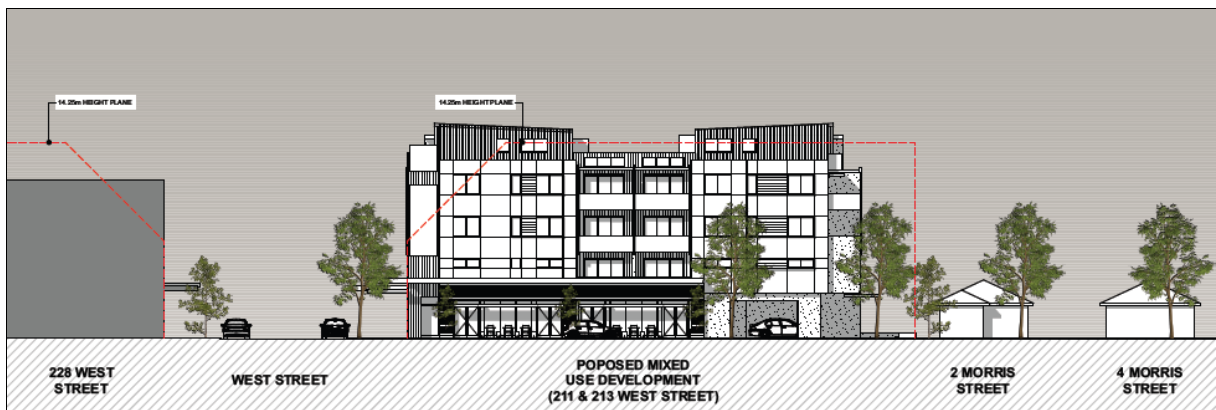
Eastern Elevation (Morris Street) of originally submitted proposal
